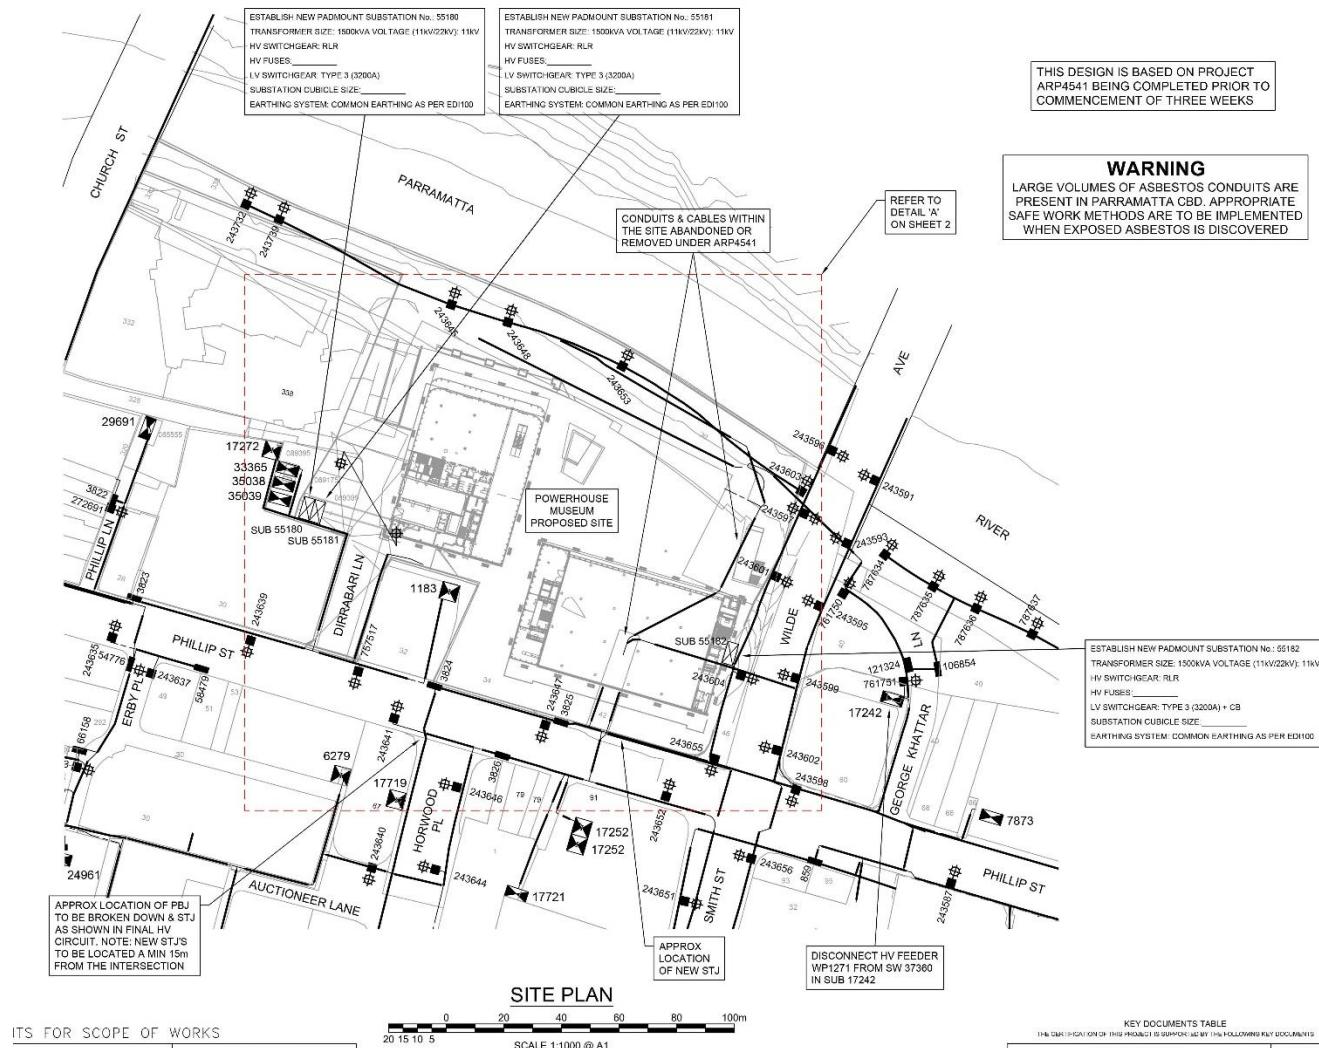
Plan of existing electrical services on the study area. (Source: ARUP)
